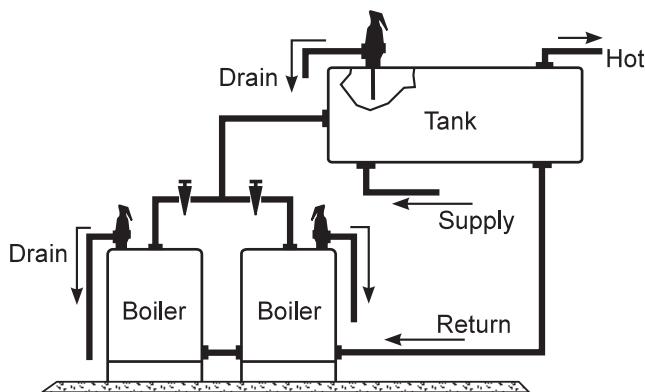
Multi-boiler hot water supply system with a pressure relief valve on each boiler and a pressure-temperature relief valve on tank
